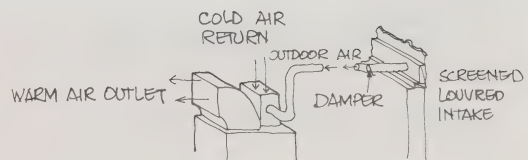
OUTDOOR AIR DUCT TO RETURN AIR PLENUM WITH DAMPER.
